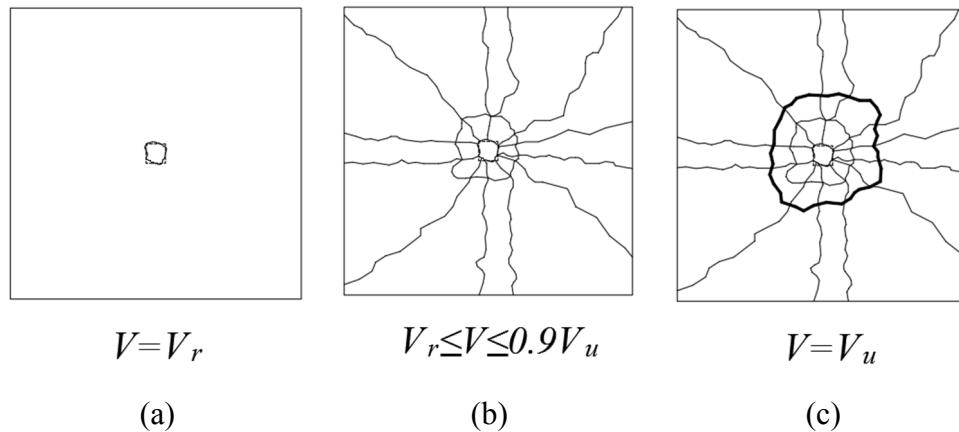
Crack pattern for: (a) Cracking load; (b) Load between cracking load and 90% of ultimate load; (c) Ultimate load.
